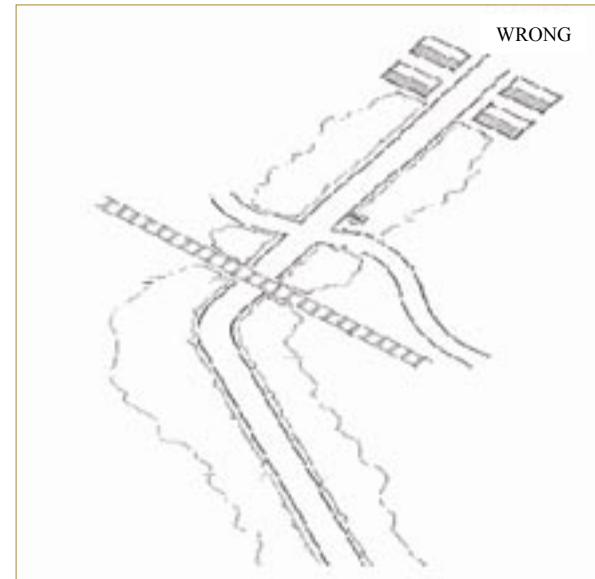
Accumulation of non visible railway crossing, road crossing and town entrance after a bend and a monotonous straight ahead section. [15]
